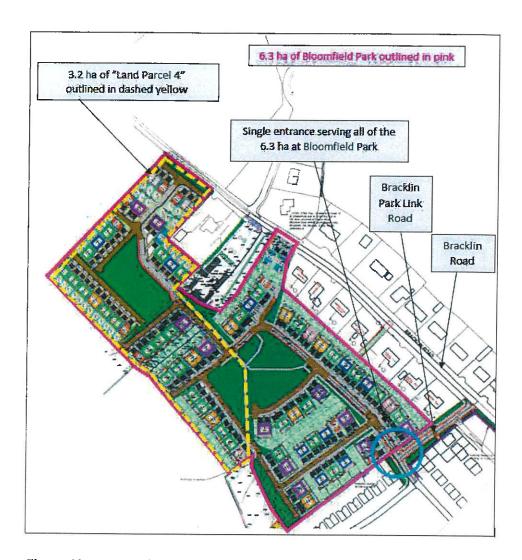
Proposed Housing Site Layout Plan for the 6.3 ha at Bloomfield Park
